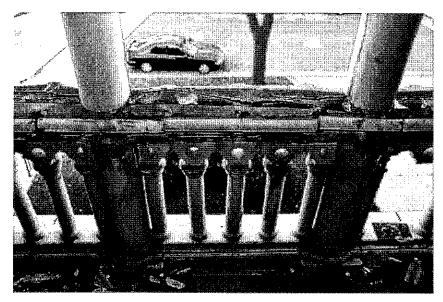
Image E: Multiple prior repairs have attempted to address cracking along the railing of the second-floor loggia. All remnants of prior repair attempts need to be removed before proceeding with new repairs.
